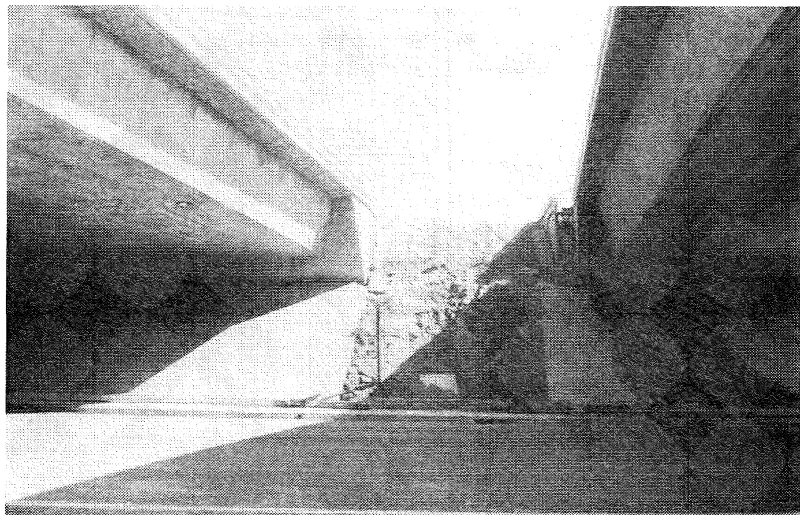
Eastern abutments of the Roxford Street Undercrossing. At this end the southern bridge displaced transversely 2 ft 6 in and the other bridge moved about 1 ft.
